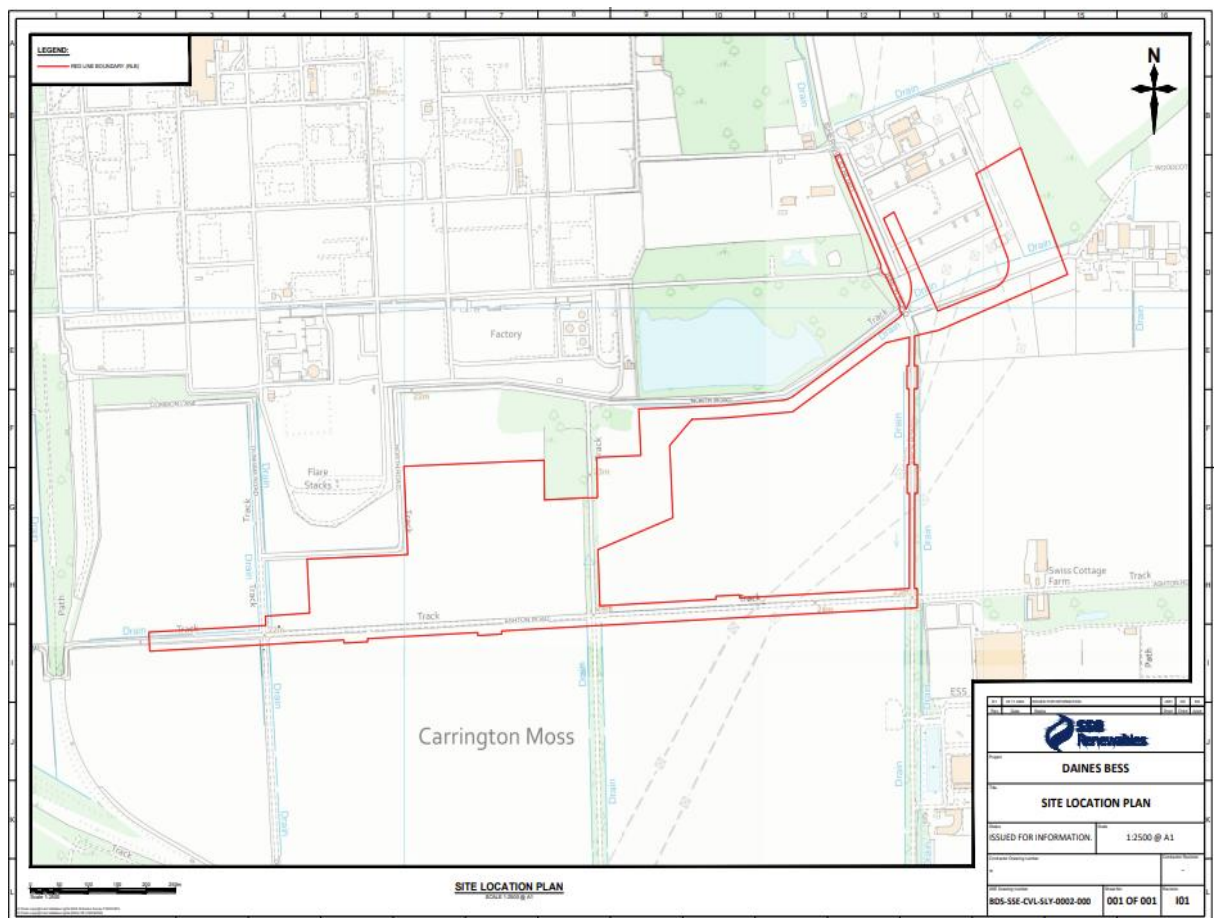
Site Location Plan for Application 115160/FULL/24 (Ref. BDS-SSE-CVL-SLY-0002-000)
